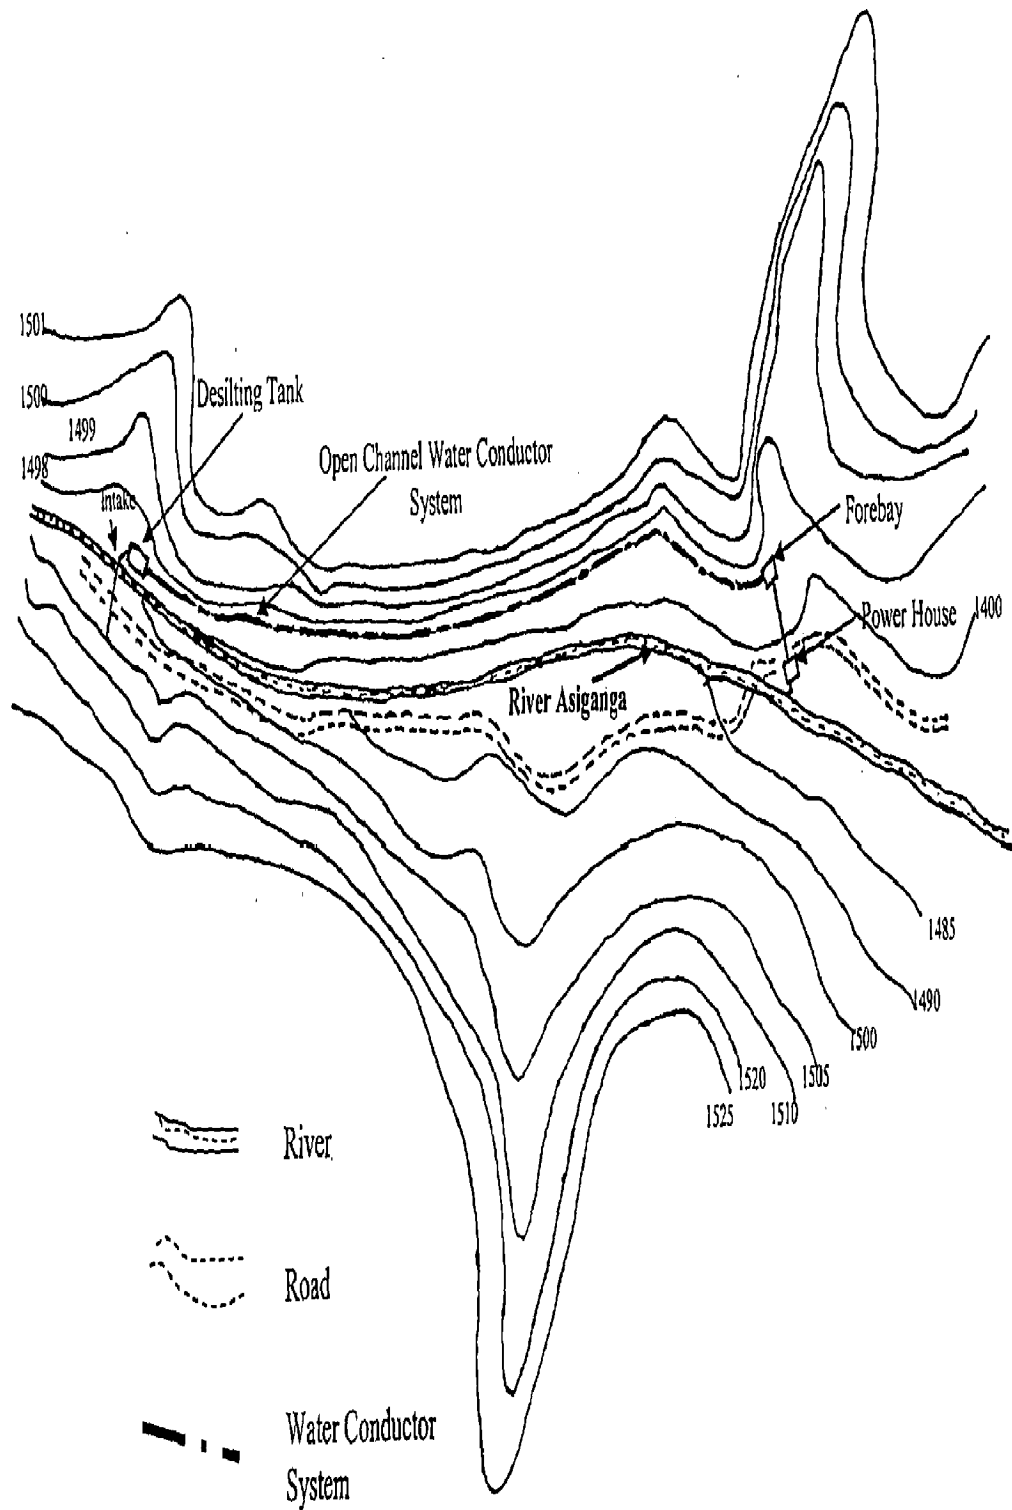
LAYOUT OF ASIGANGA STAGE - I SMALL HYDRO PROJECT
